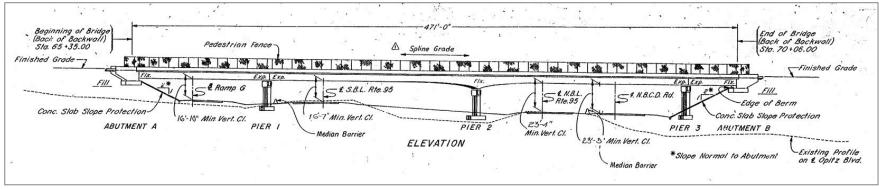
Existing Bridge Elevation (Reference: VDOT, 1979, Sheet 2 of 47)
